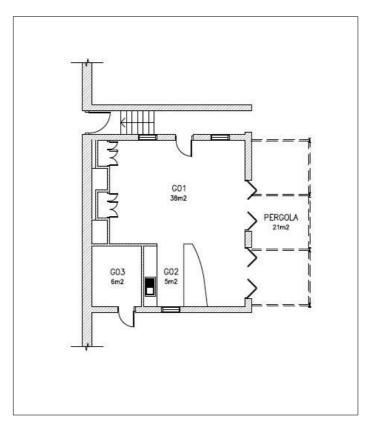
Floor Plan. UNSW Information Services. Plan last modified Setpember 2010.
